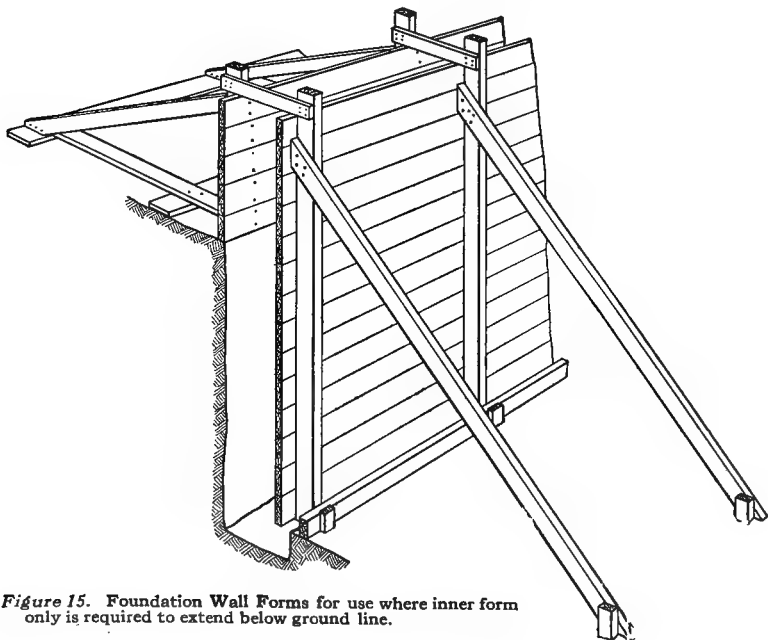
Foundation Wall Forms for use where inner form only is required to extend below ground line.
